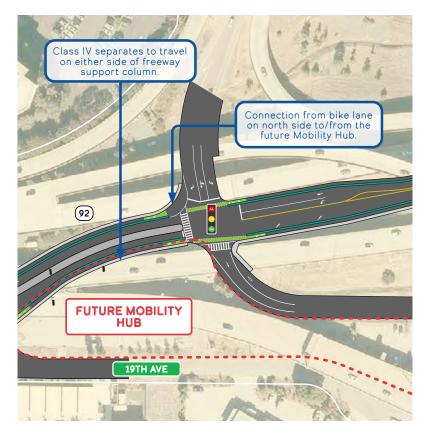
G US 101 ACCESS RAMP INTERSECTION CONCEPT PLAN
